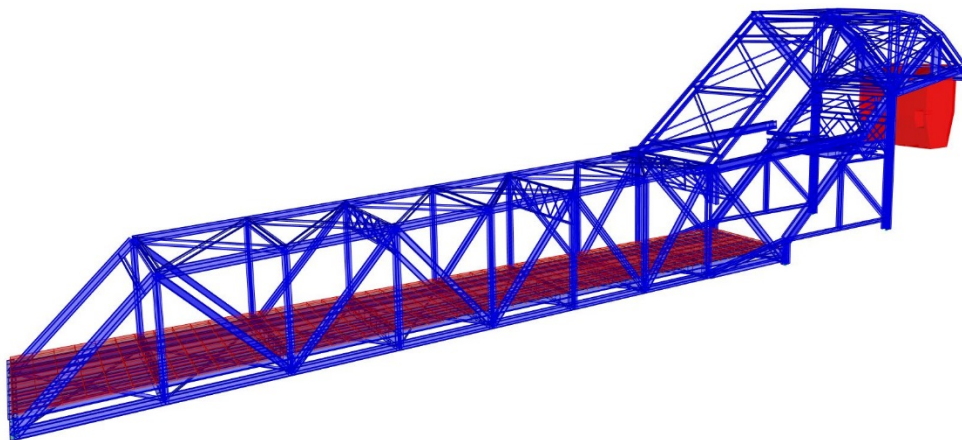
LaSalle Causeway Bascule Bridge Finite Element Model
